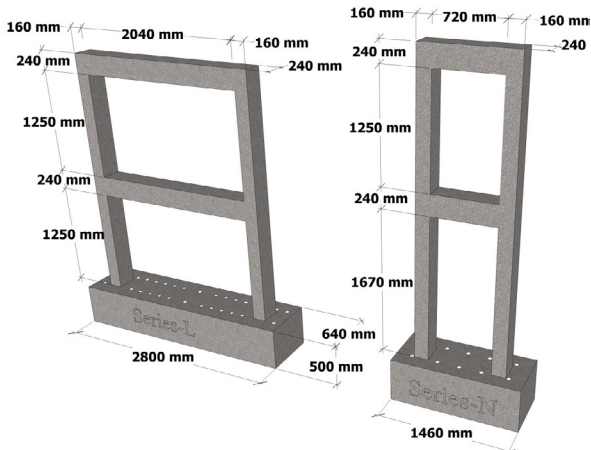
Dimensions of the 1/2-scaled test specimens.
